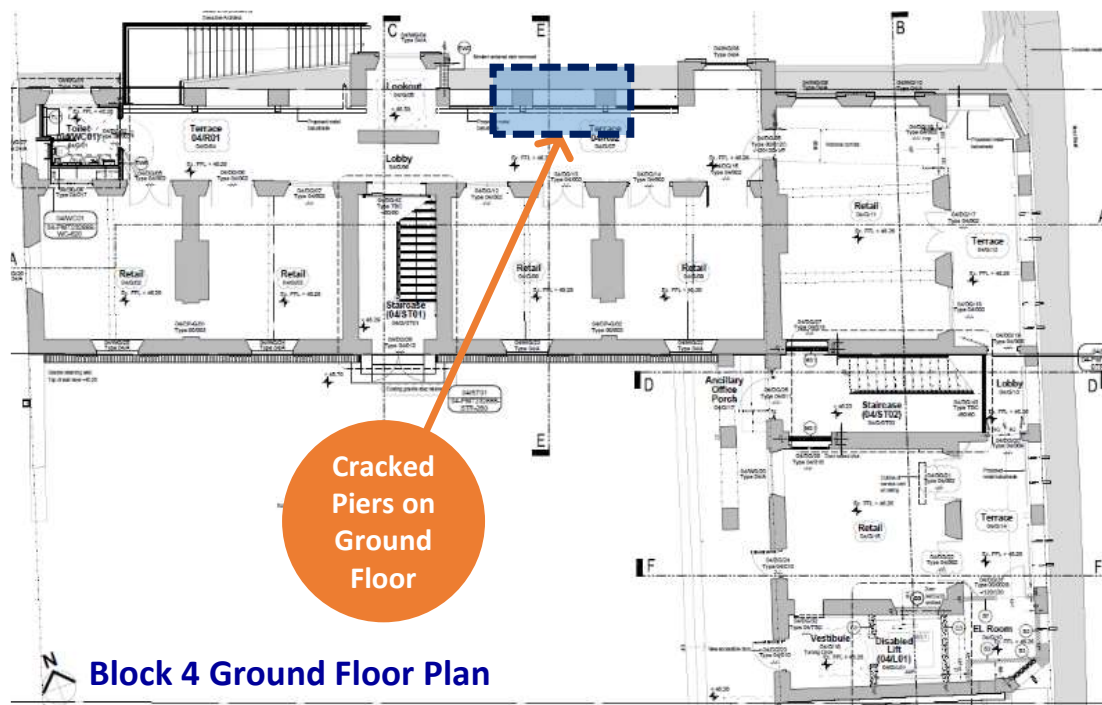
2014 repair works, major cracks in two brick piers on north facade discovered (Note – These two brick piers were repaired);
